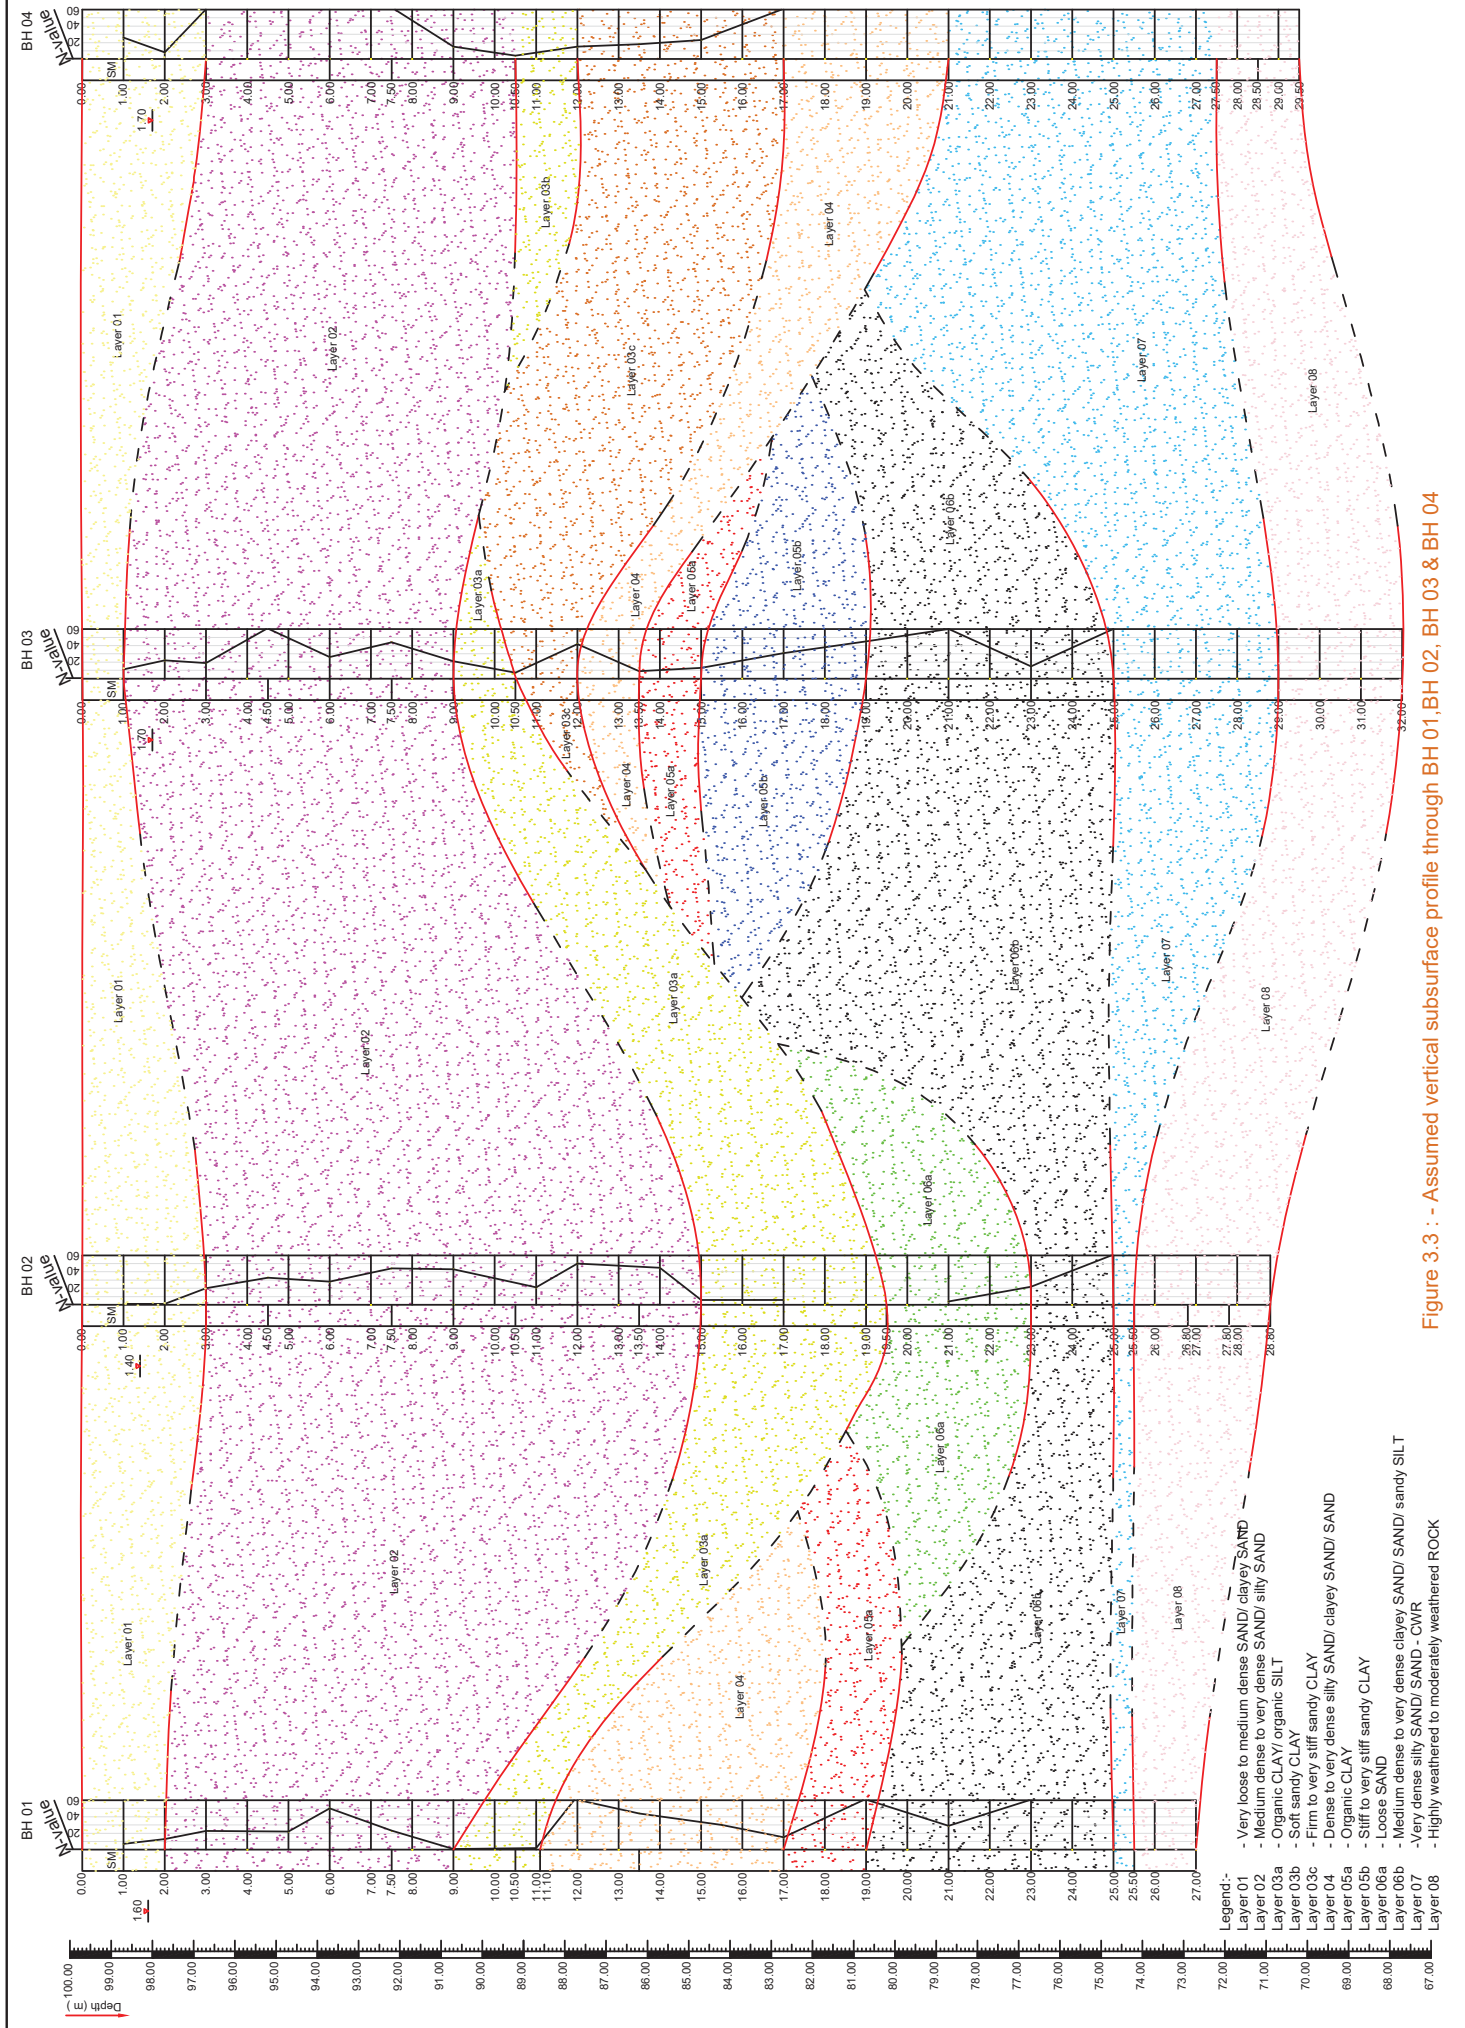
Assumed vertical subsurface profile through BH 01, BH 02, BH 03 & BH 04
